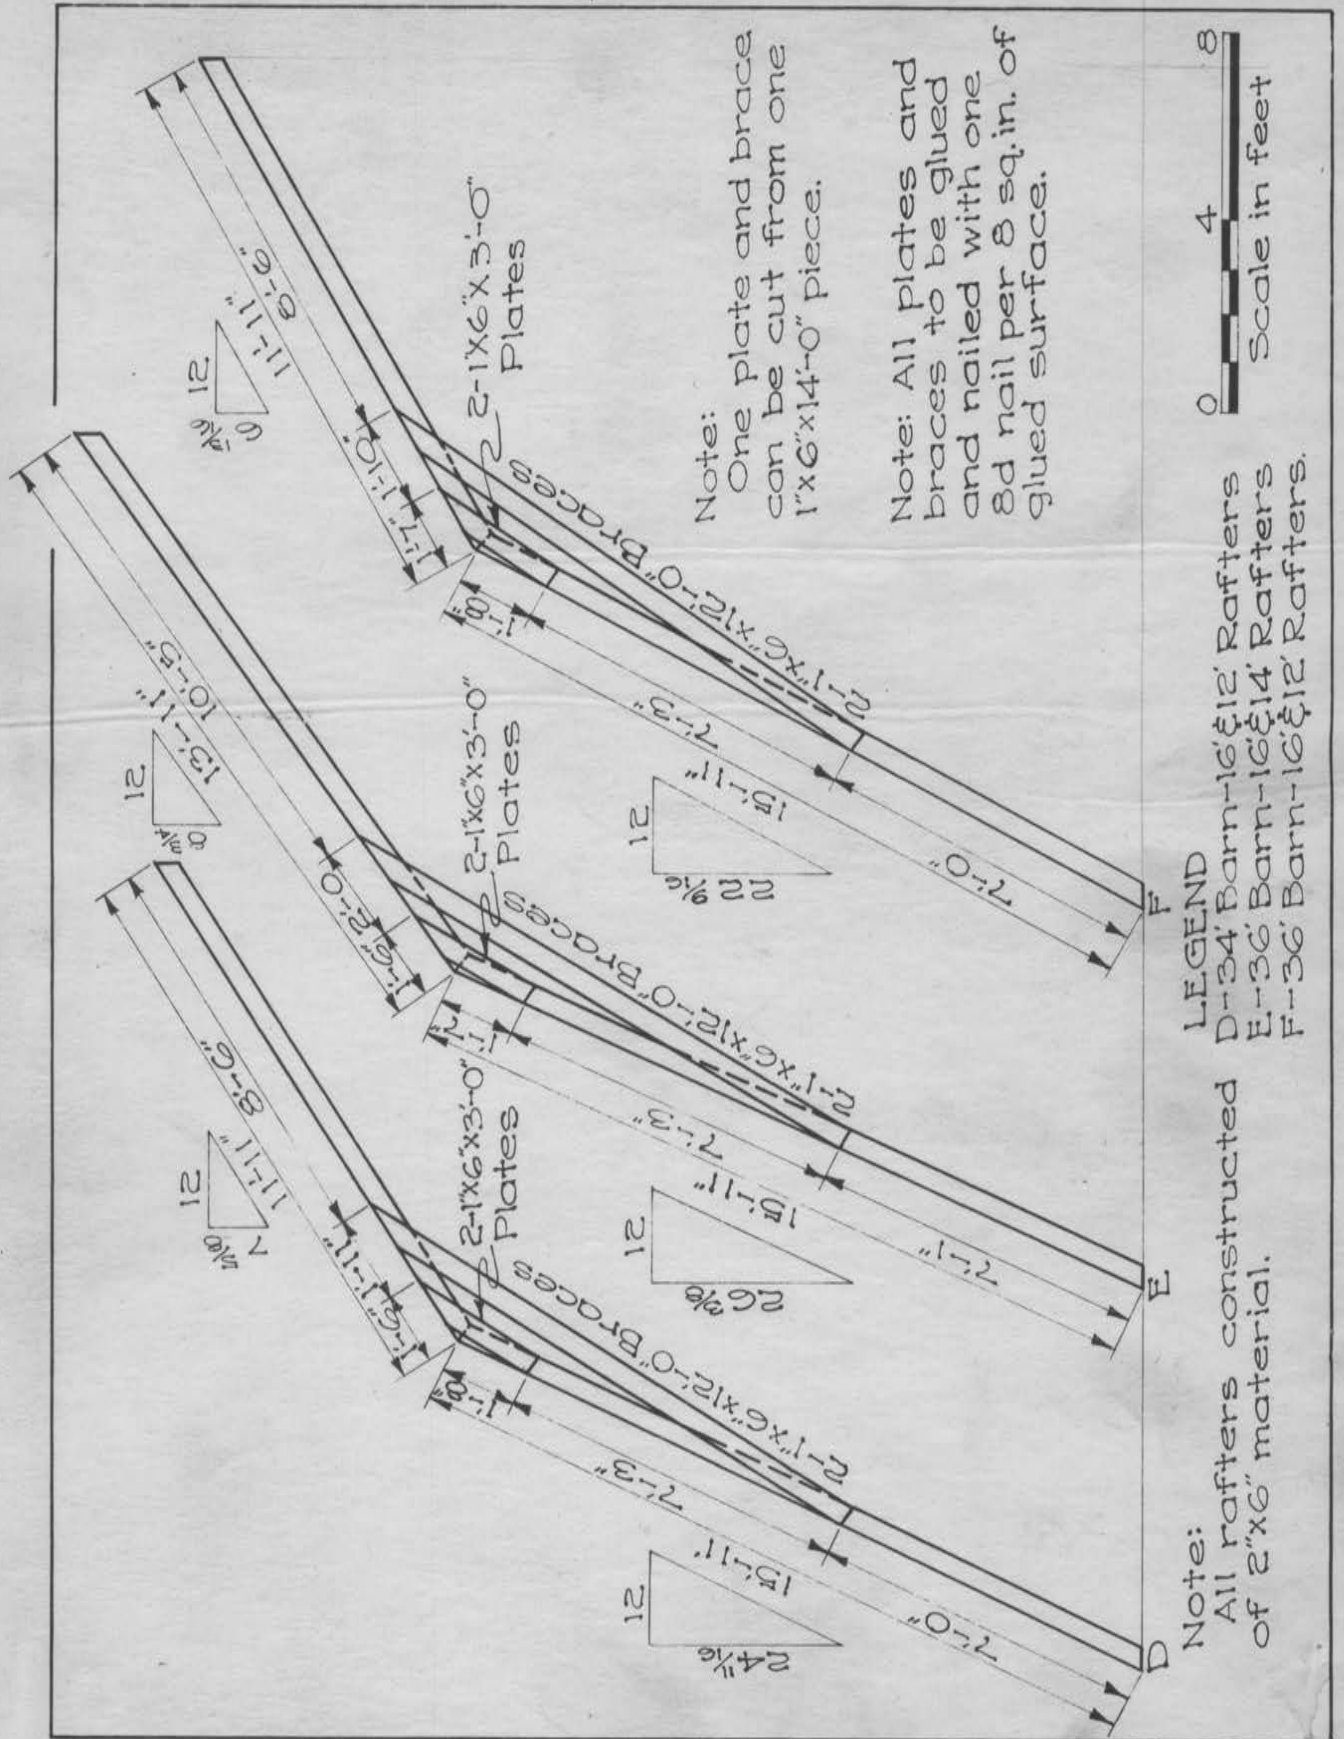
Detail Plan of Rafters- 34' & 36' widths.
